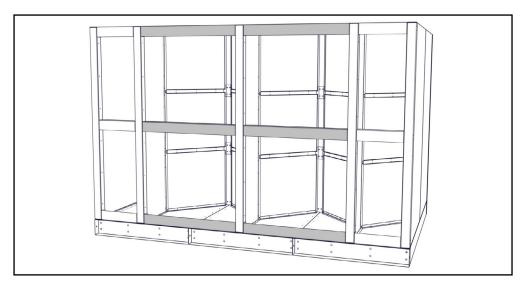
INSTALL 2 CORE SUPPORT BRACKETS
